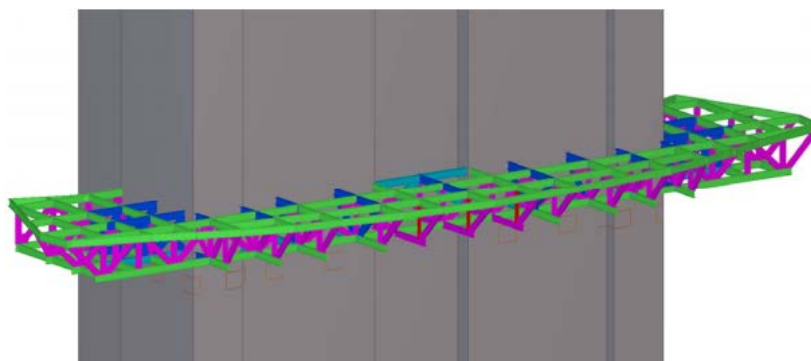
Completed diagram of the cantilever truss of the cantilever steel structure main body
